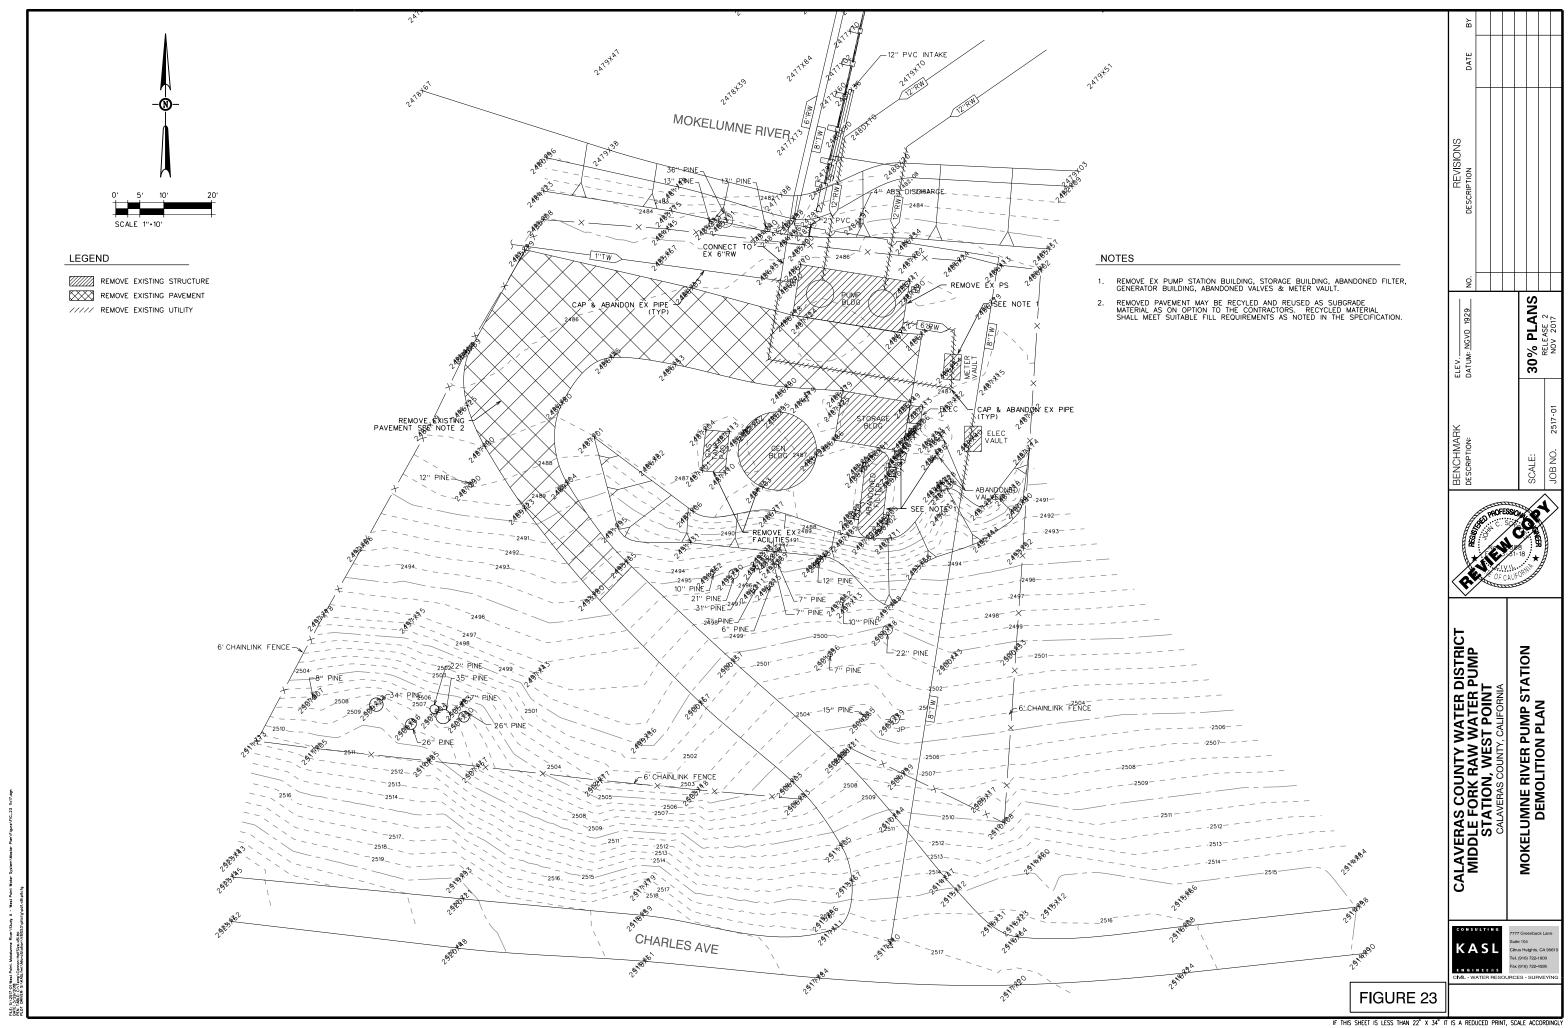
presents the proposed MFMR Pump Station Demolition Plan. The existing pump station building, storage building, abandoned filter, standby generator building and fuel tank pad would be removed together with existing pavement. The pavement removed could be ground and reused as subgrade for the new pump station construction. Demolition of existing improvements will need to protect the 8-inch diameter treated water line which crosses through the pump station site and serves nearby Wilseyville residents. Similarly, the existing 6-inch diameter raw water supply line that crosses the Middle Fork within
